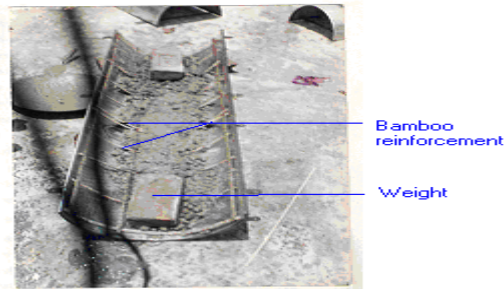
Progress of casting the half round bamboo reinforced precast section
